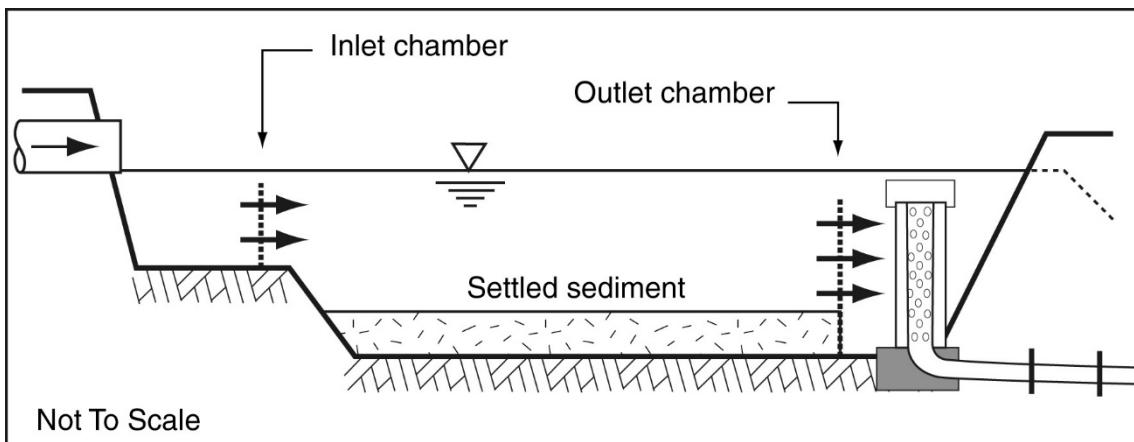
Typical arrangement of an inlet and outlet chamber (long-section)
